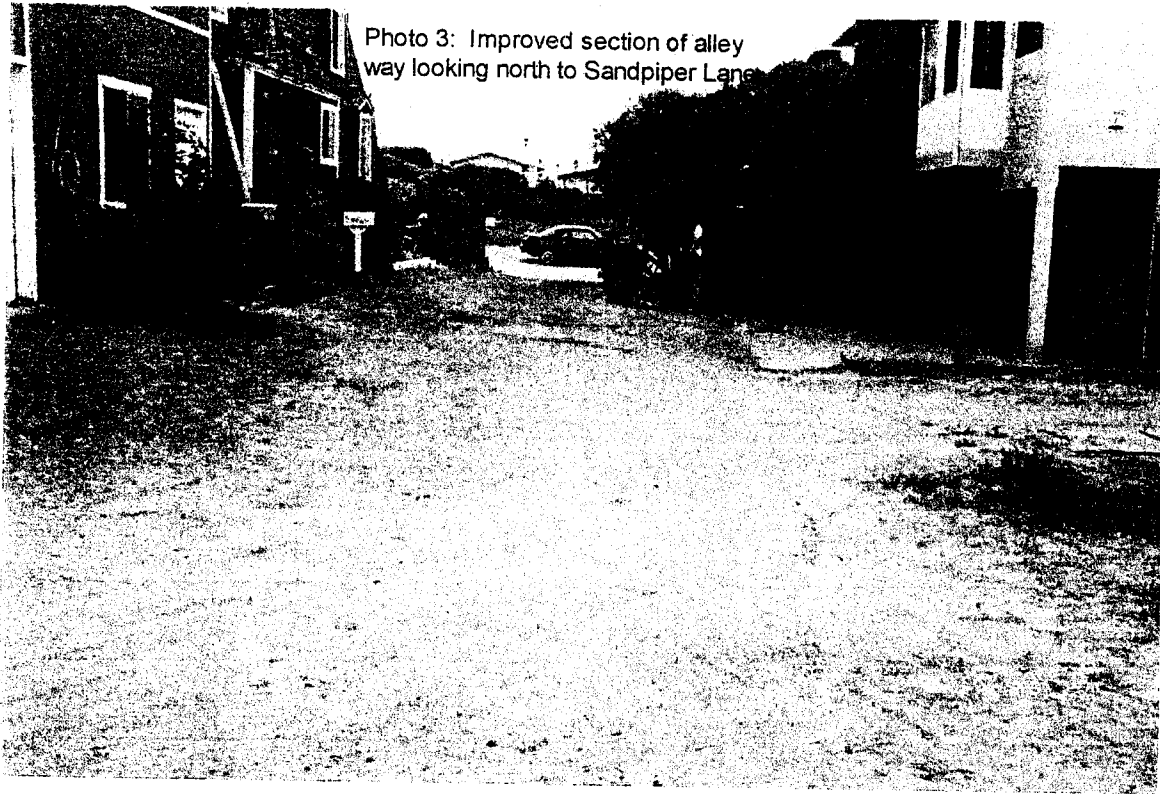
Improved section of alley way looking north to Sandpiper Lane
